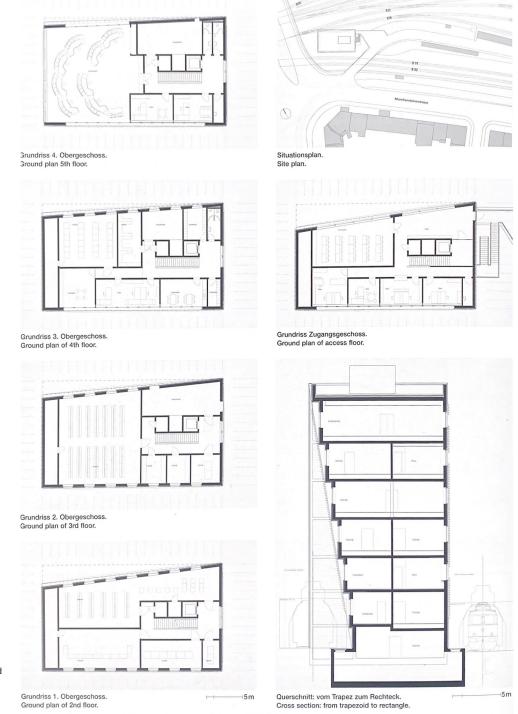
Drawings of floor plans and section. Transition from the trapezium to the rectangle.
